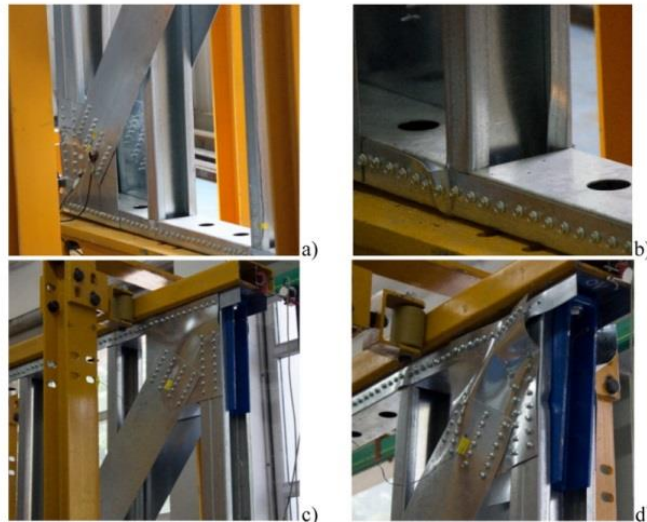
Failures walls: a) local buckling of the tracks; b) squashing of the stud ends; c) out-of-plane deformation of the gusset plate; d) gusset-to-track connection failure [88]
